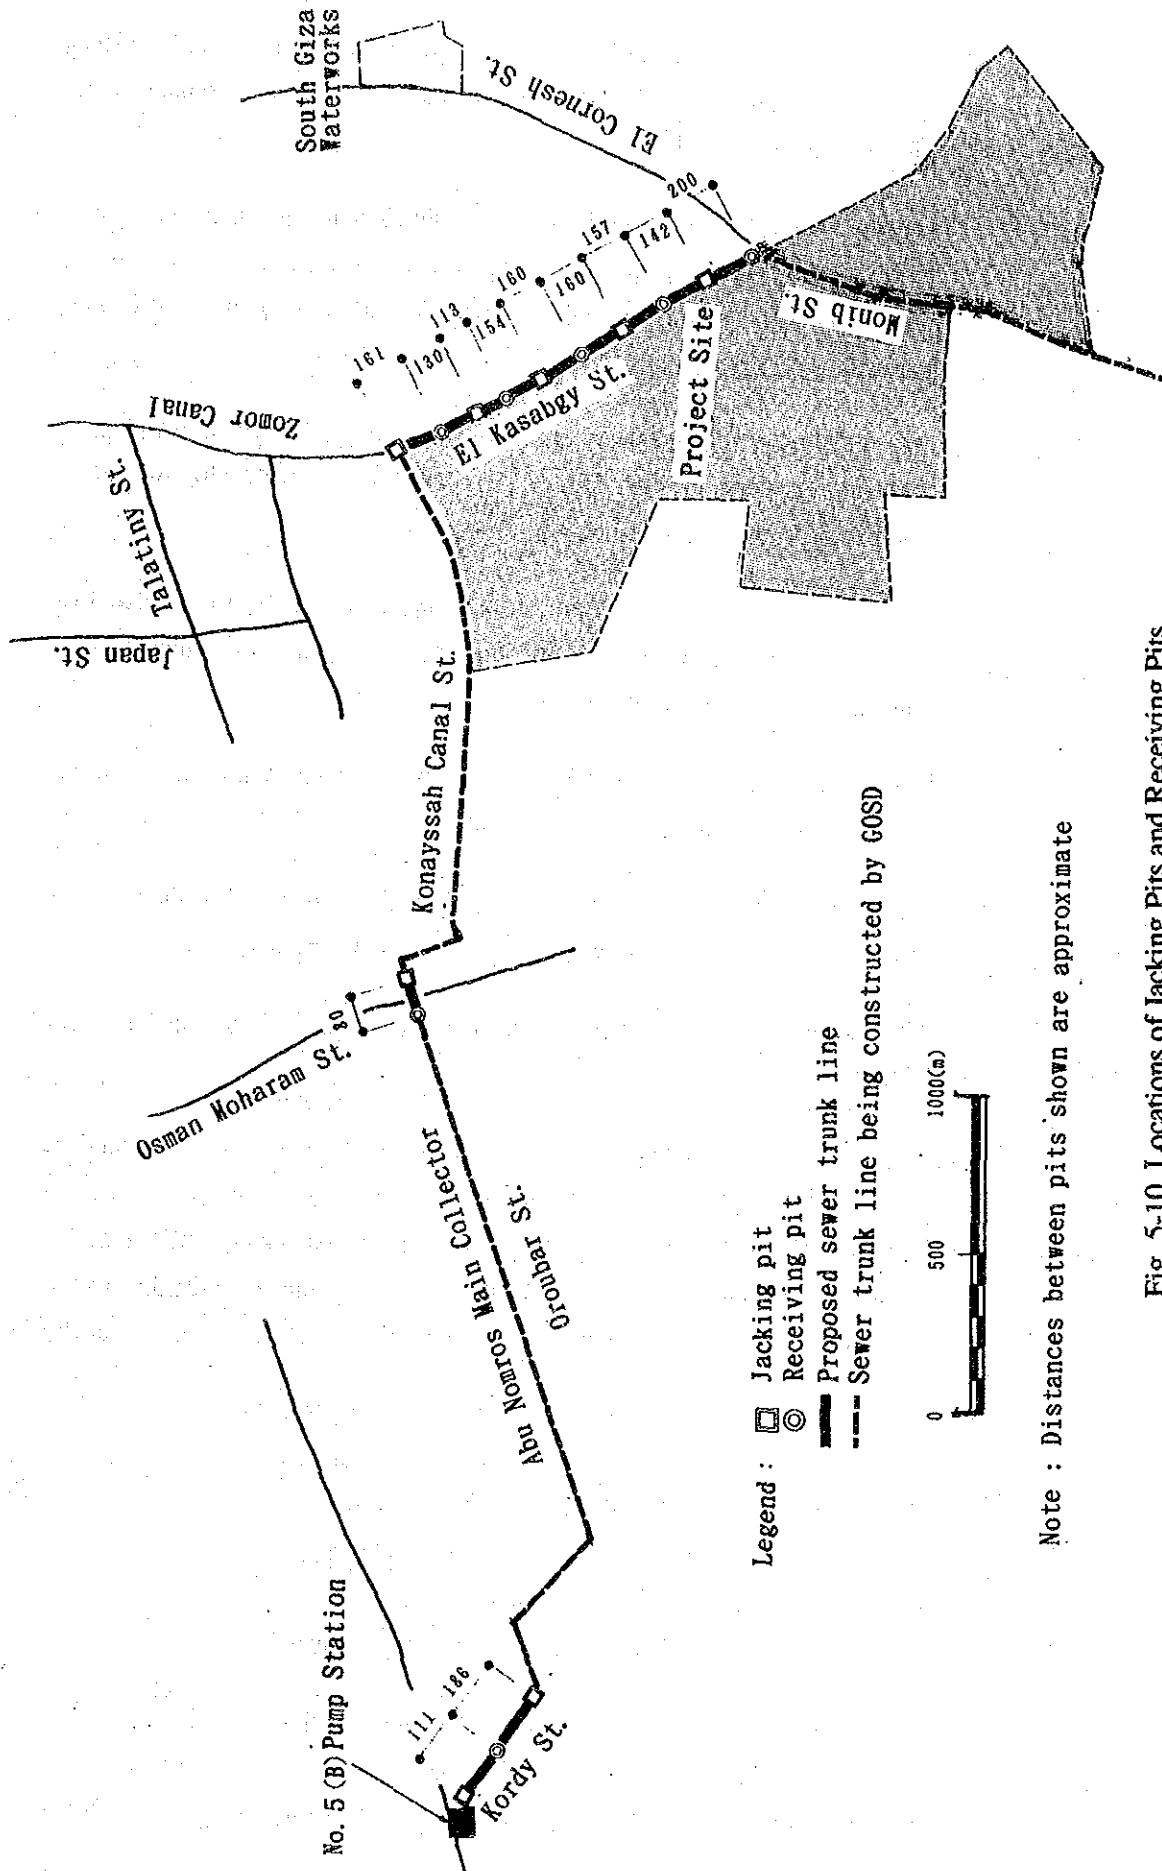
Locations of Jacking Pits and Receiving Pits
